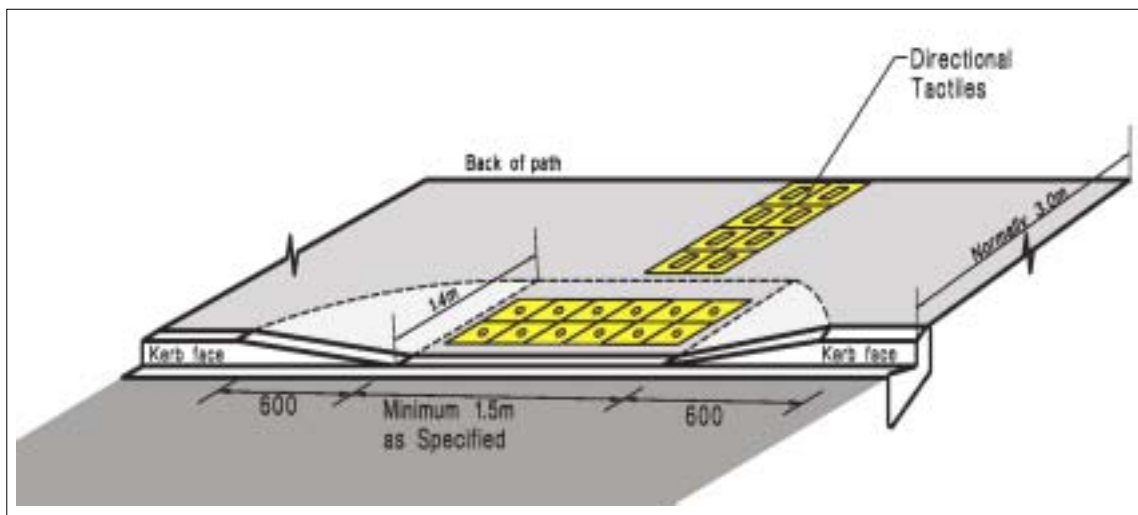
Standard kerb ramp design, assuming a full kerb height of 100mm.
